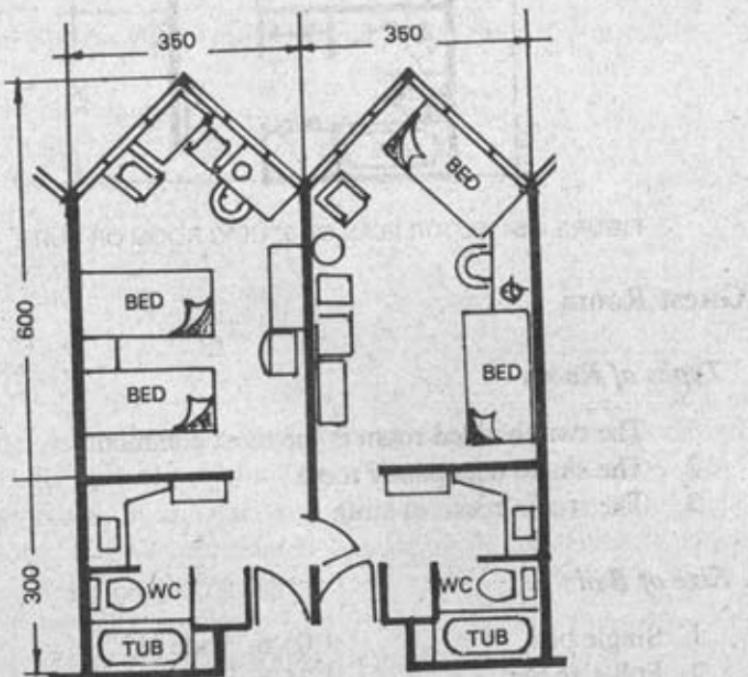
PLAN OF STUDIO ROOM OR SUITE
